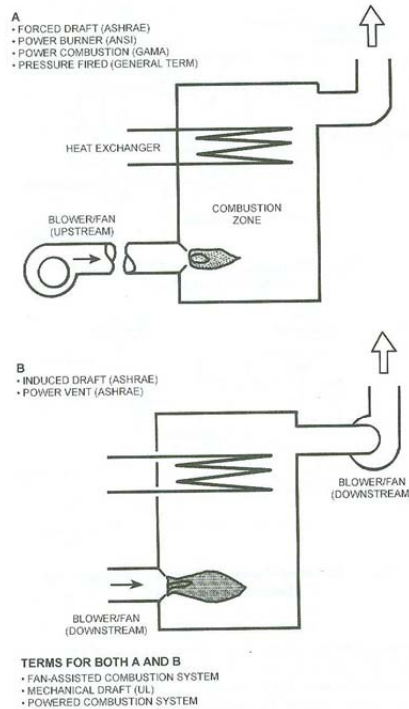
Terminology Used to Describe Fan-Assisted Combustion
